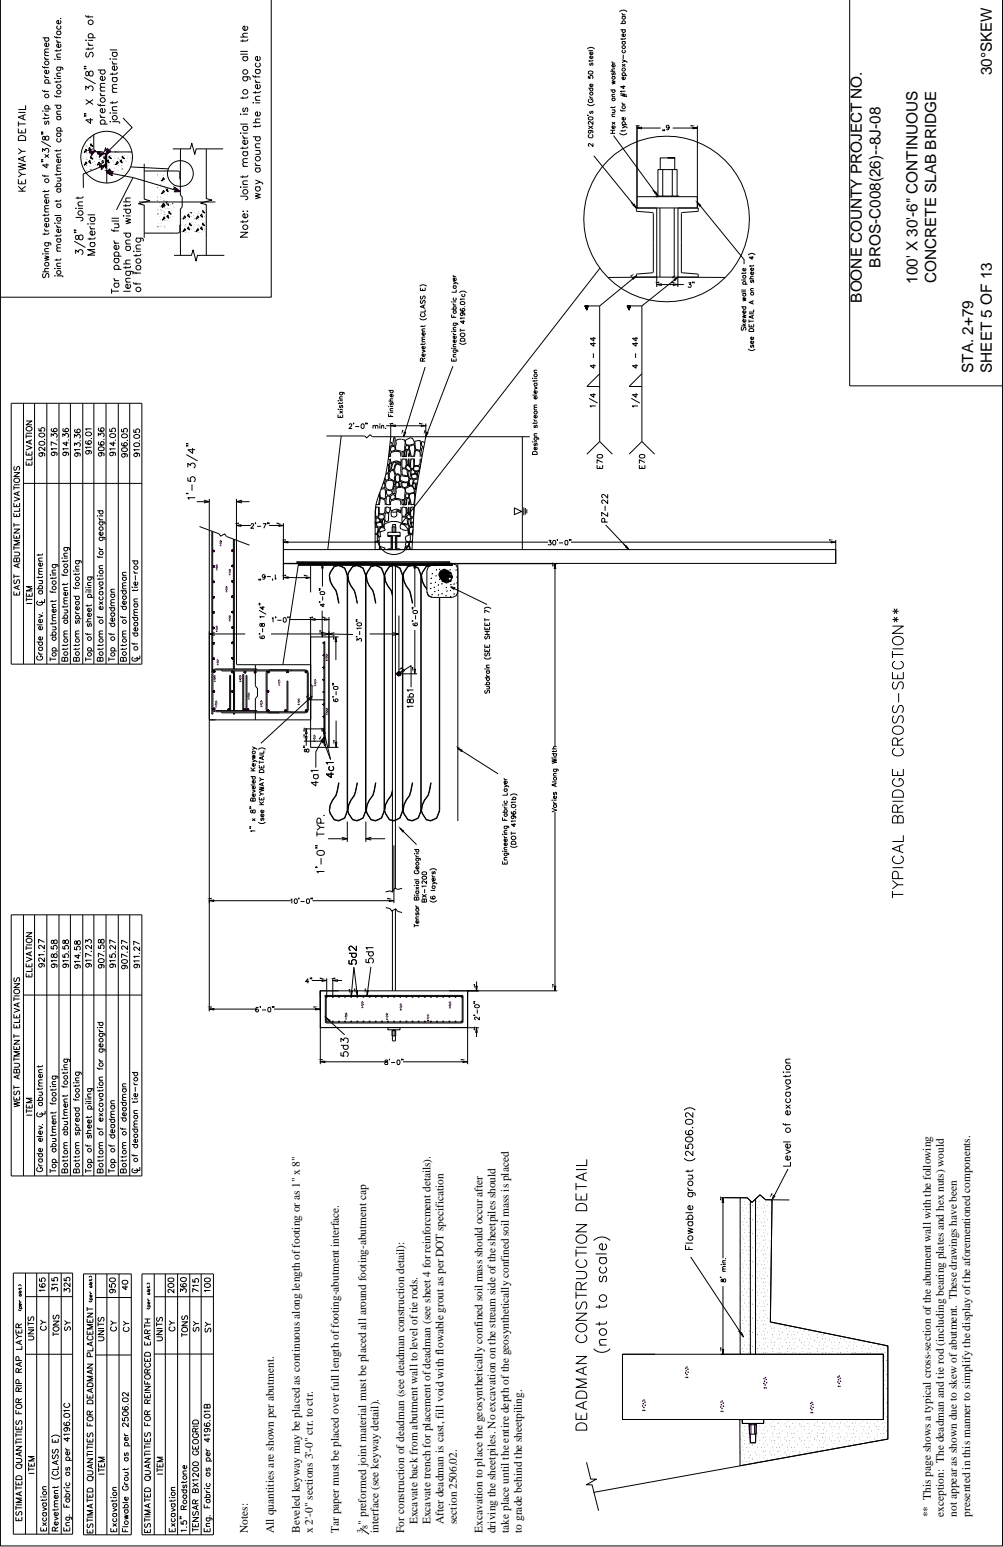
Cross-section of abutment for demonstration project in BC, Iowa.
